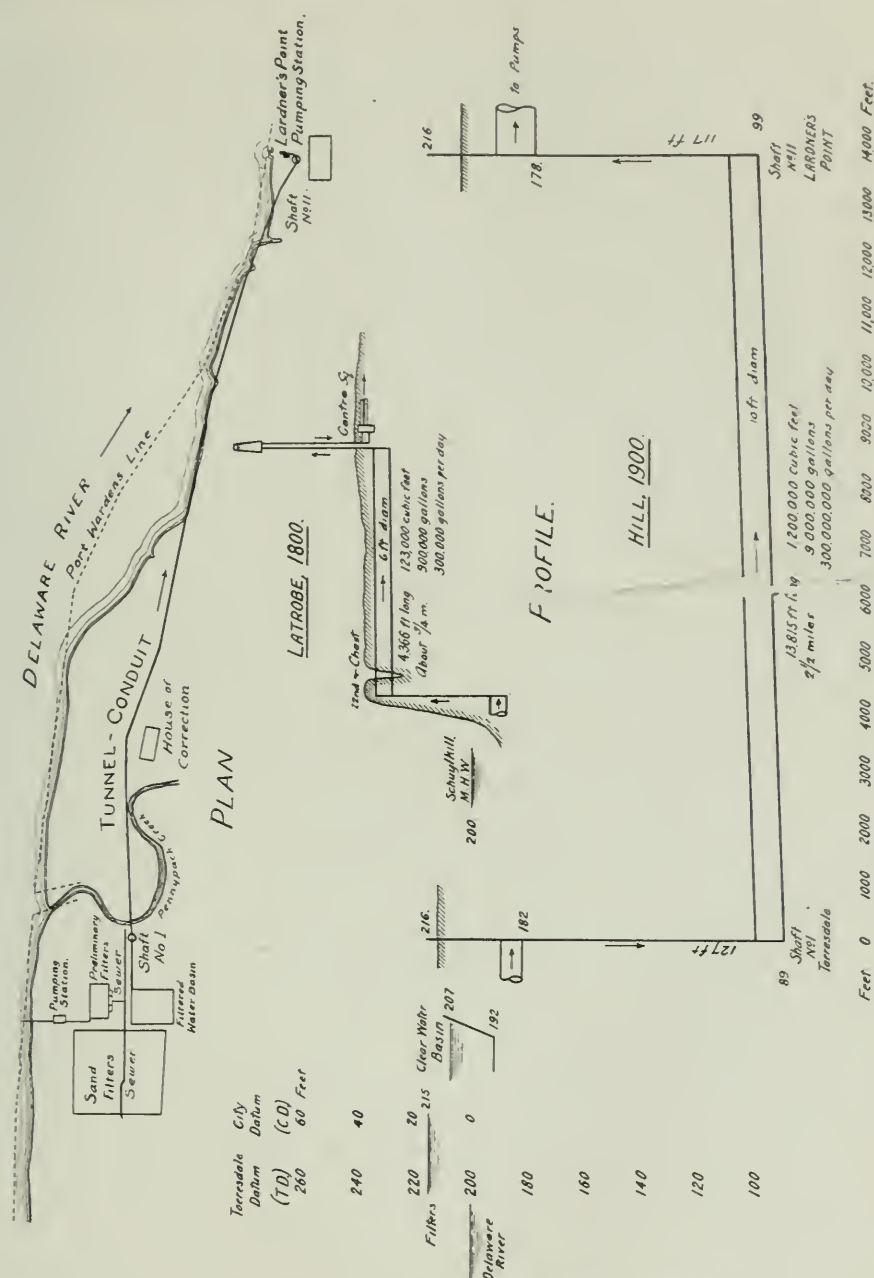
Plan and profile of Torresdale tunnel conduit of 1900, and profile of conduit of 1800.
